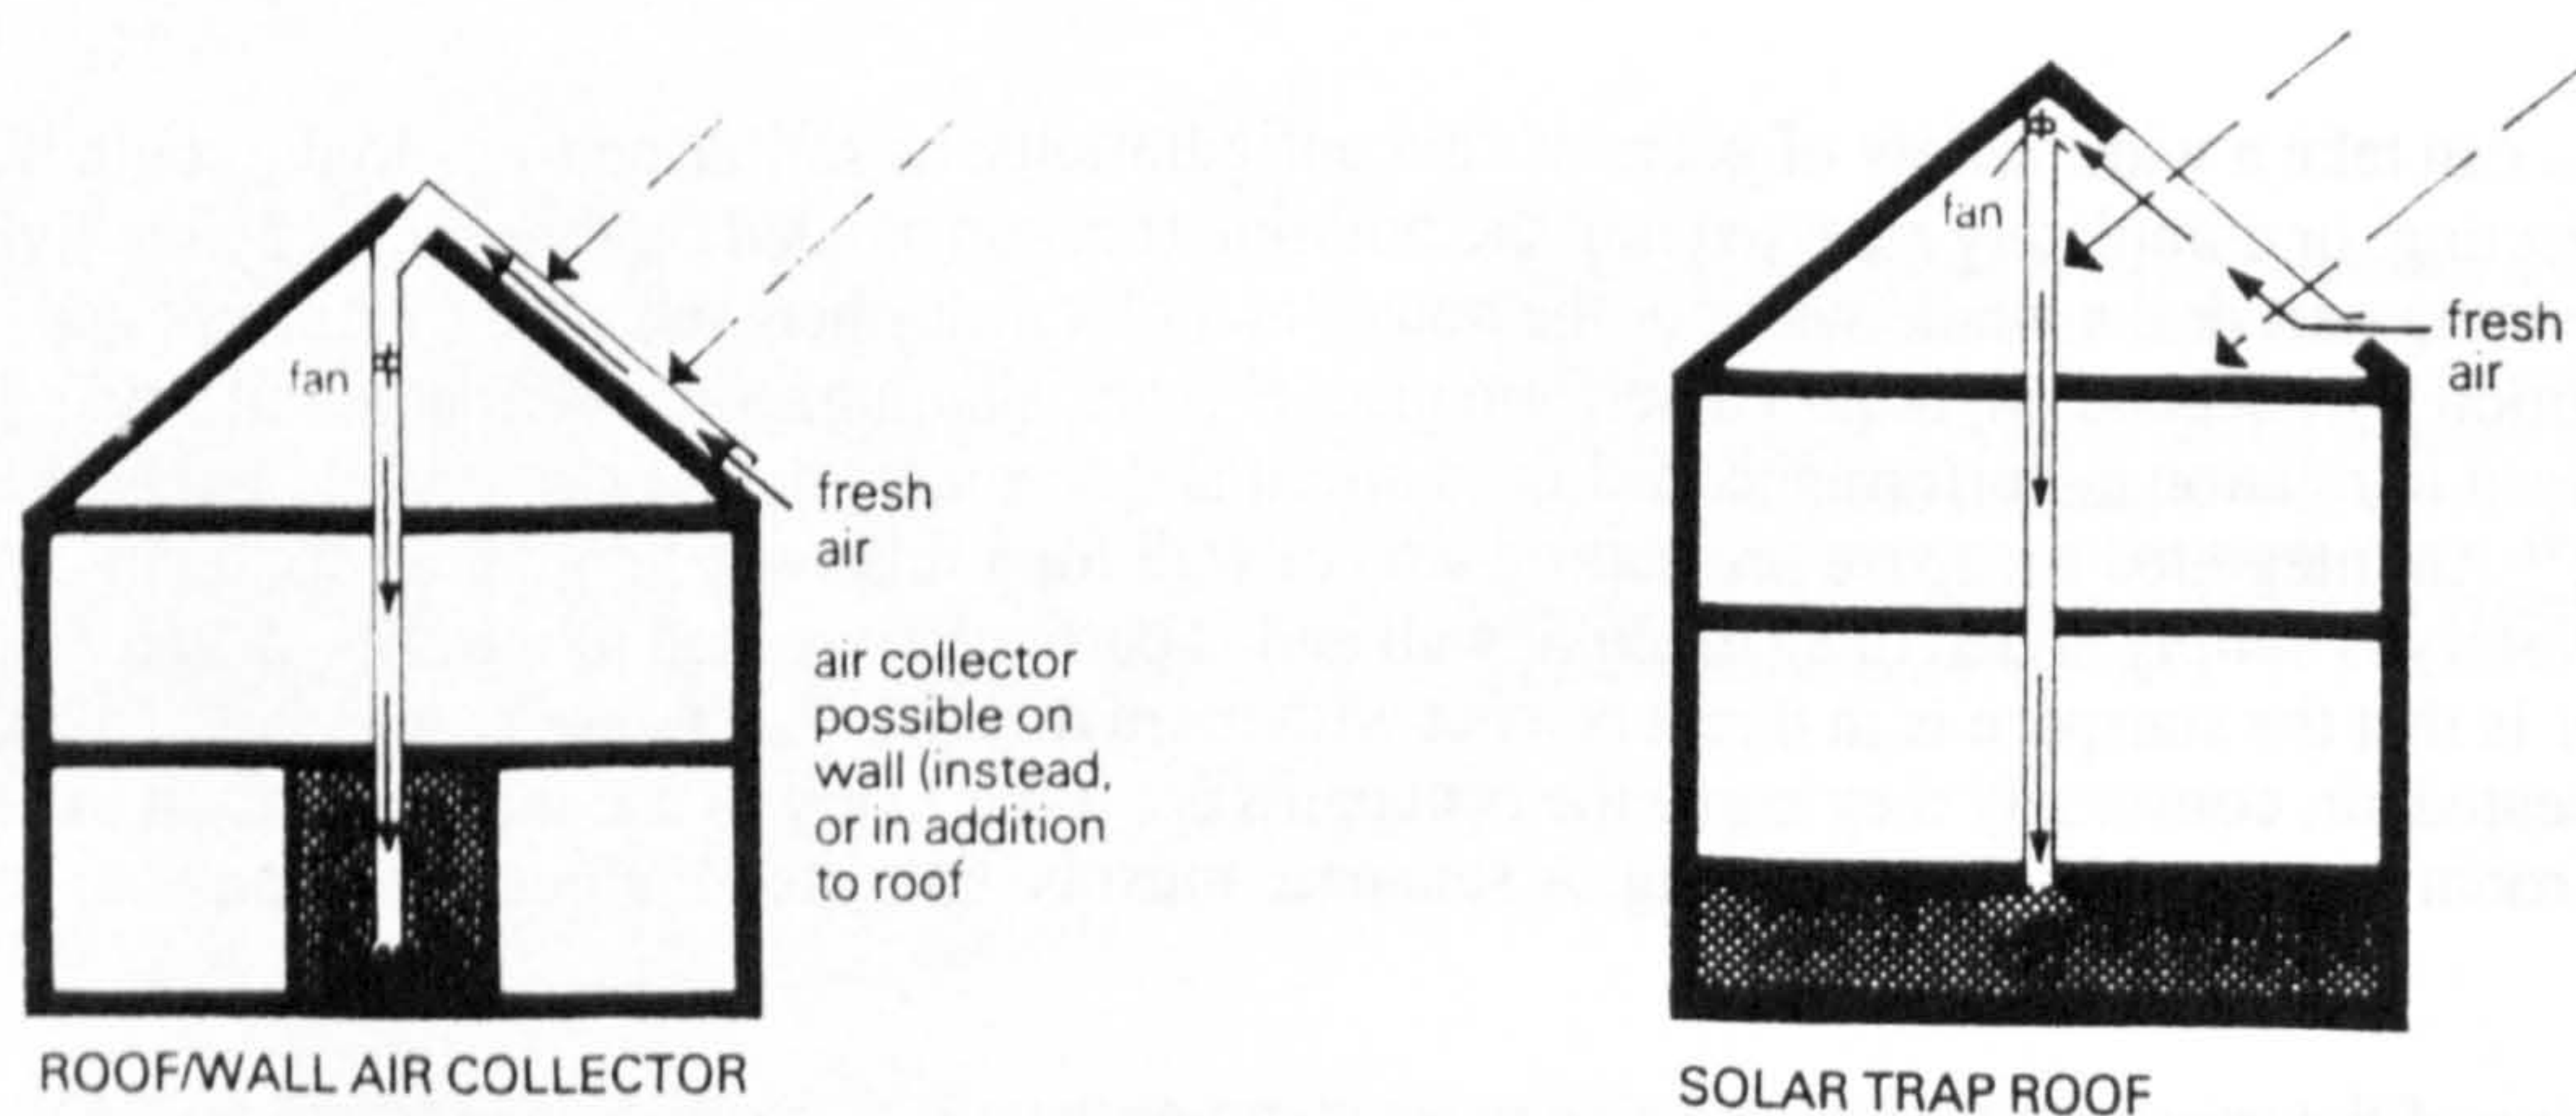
Solar trap roof and roof/wall air collector<sup>95</sup>
